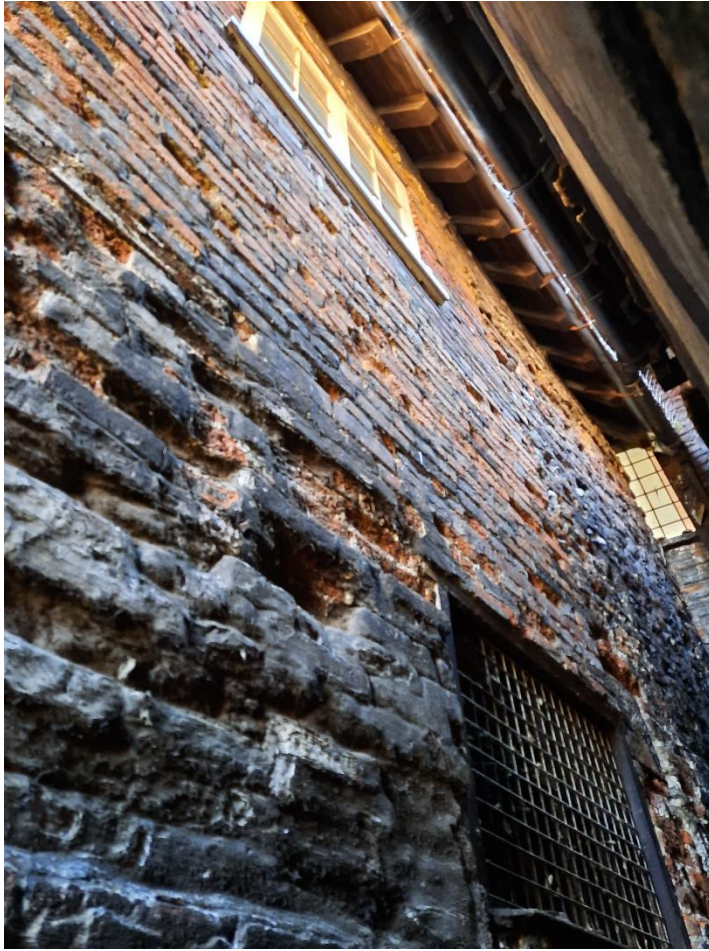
East elevation of 26-28 Elm Hill – Brickwork has been severely structurally damaged by the moist emissions from the kitchen flue unlawfully installed immediately opposite. Windows of 26-28 Elm Hill are directly above the extract, which makes them unopenable due to the stench of the deep fat fryer fumes. Even with the windows shut, the whole of 26-28 Elm Hill reeks with the fumes from the unlawful extract which permeate through the masonry when the extract is in use. This explains in part why 26-28 Elm Hill has remained untenanted for so many years and has ended up on the Historic England's National Heritage at Risk register, where it will remain whilst it is blighted by such offensive odours, fire risk and damage from the neighbouring flue extract.
